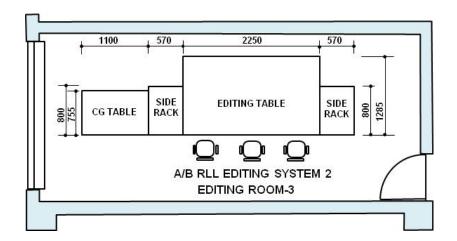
Equipment Arrangement of Editing Room-3
